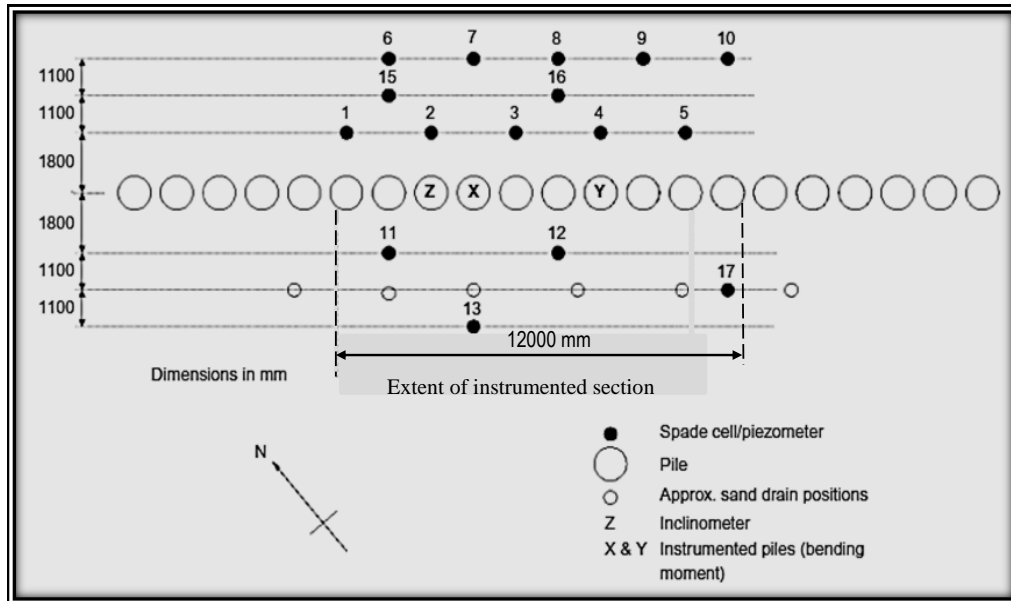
Plan of instrumented section at CTRL, Ashford (From Clark, 2006).
